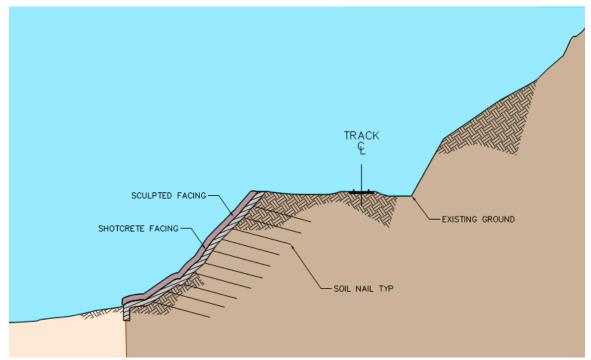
Typical Section of Soil Nail Reinforcement - Trackbed Support Stabilization Areas
